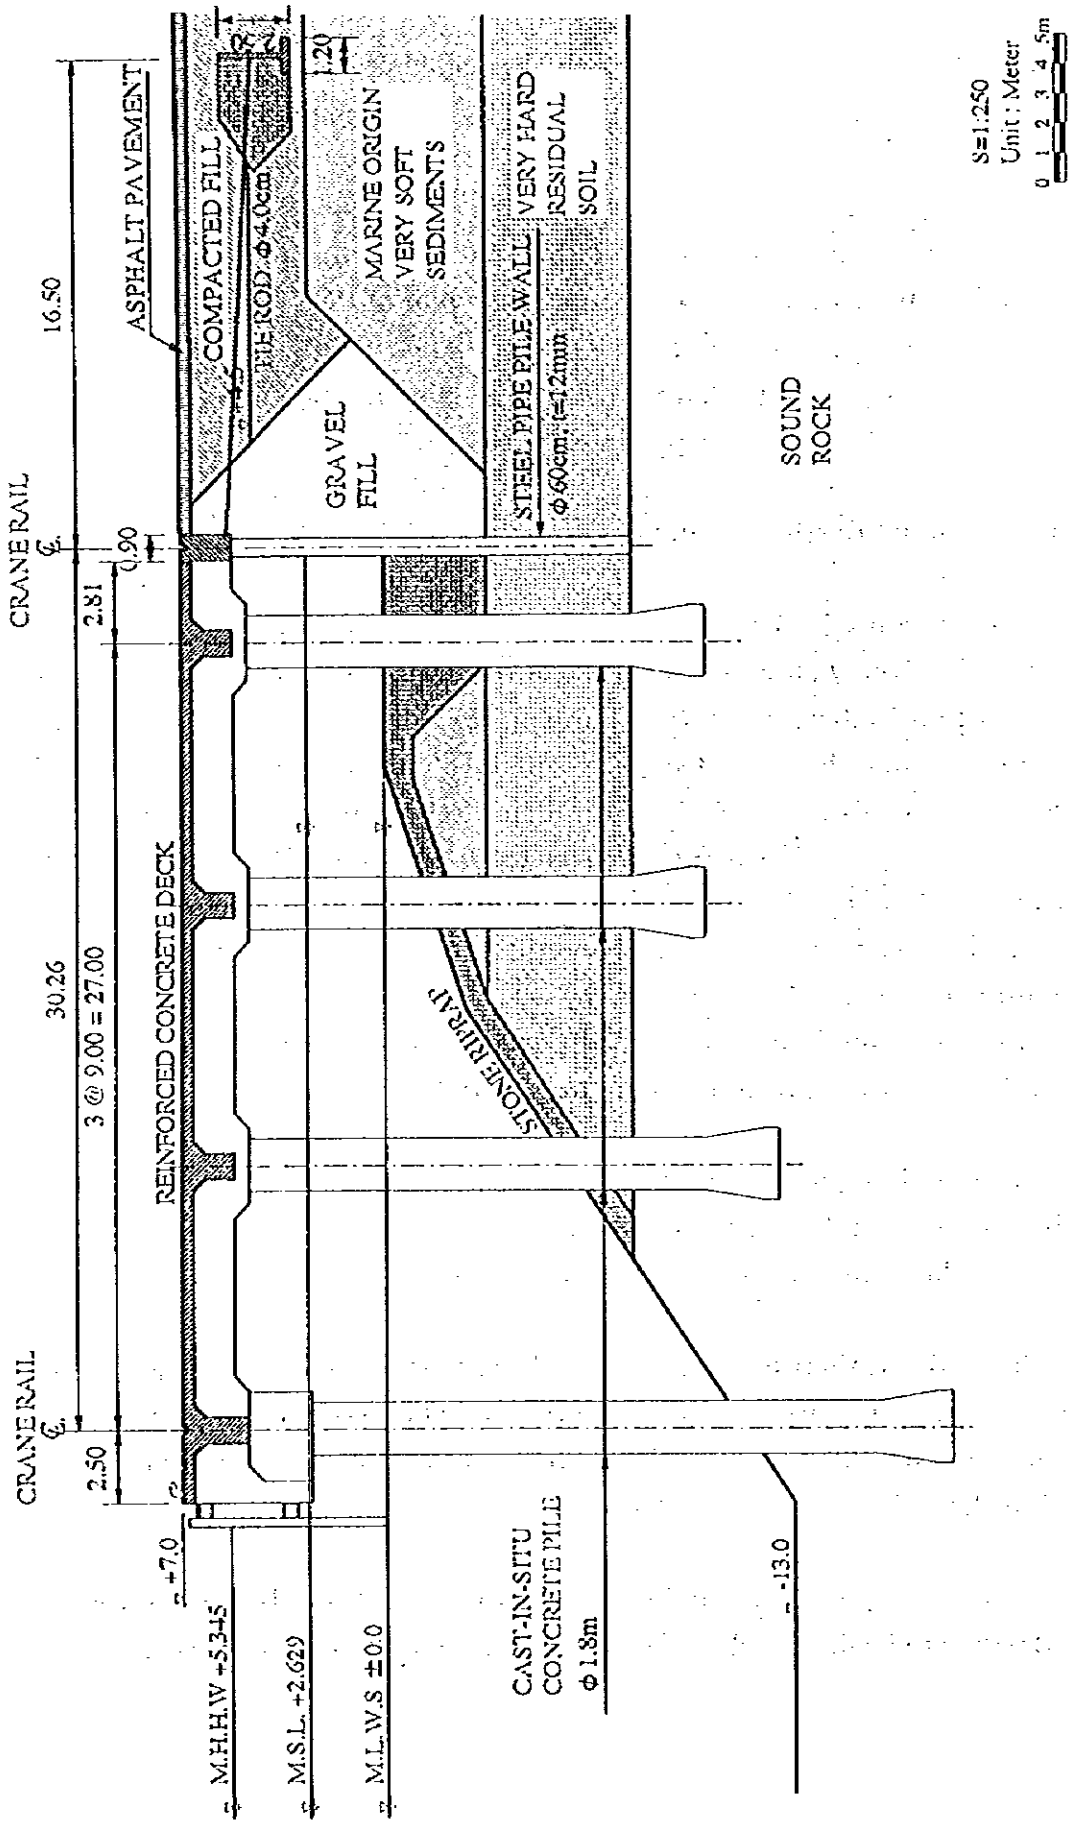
Conceptual Cross Section of Container Terminal Berth Alt.-1
